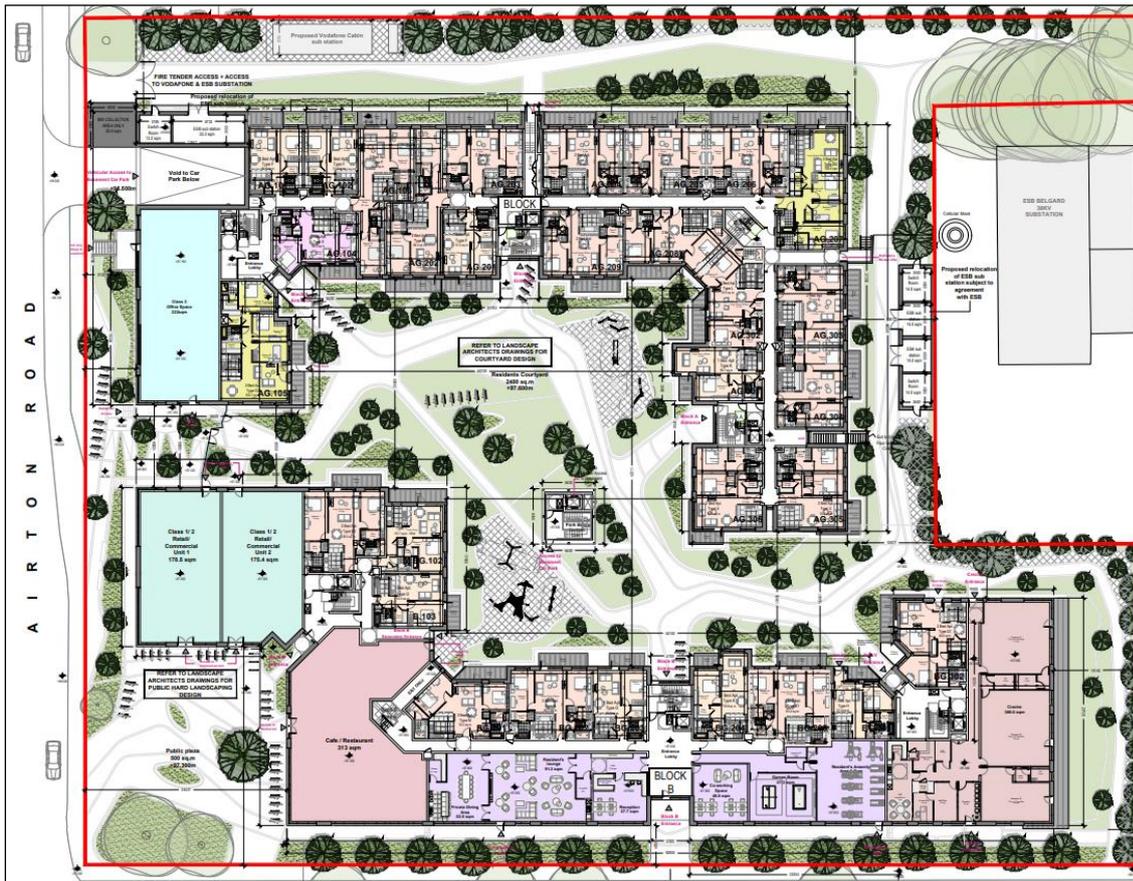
Ground floor layout plan approved under ABP Ref. ABP-305763-19
